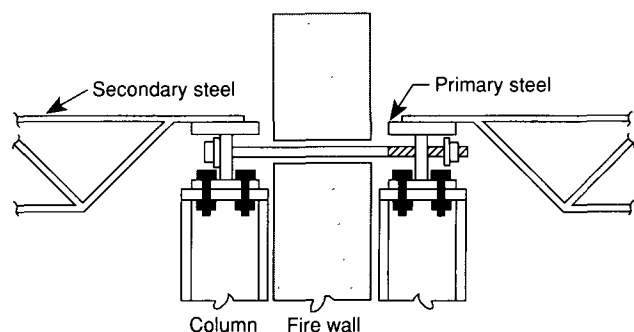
(g) Through-wall tie — primary steel parallel to fire wall.
